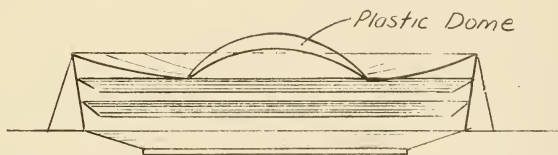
REMOVABLE ENCLOSING ROOFS
